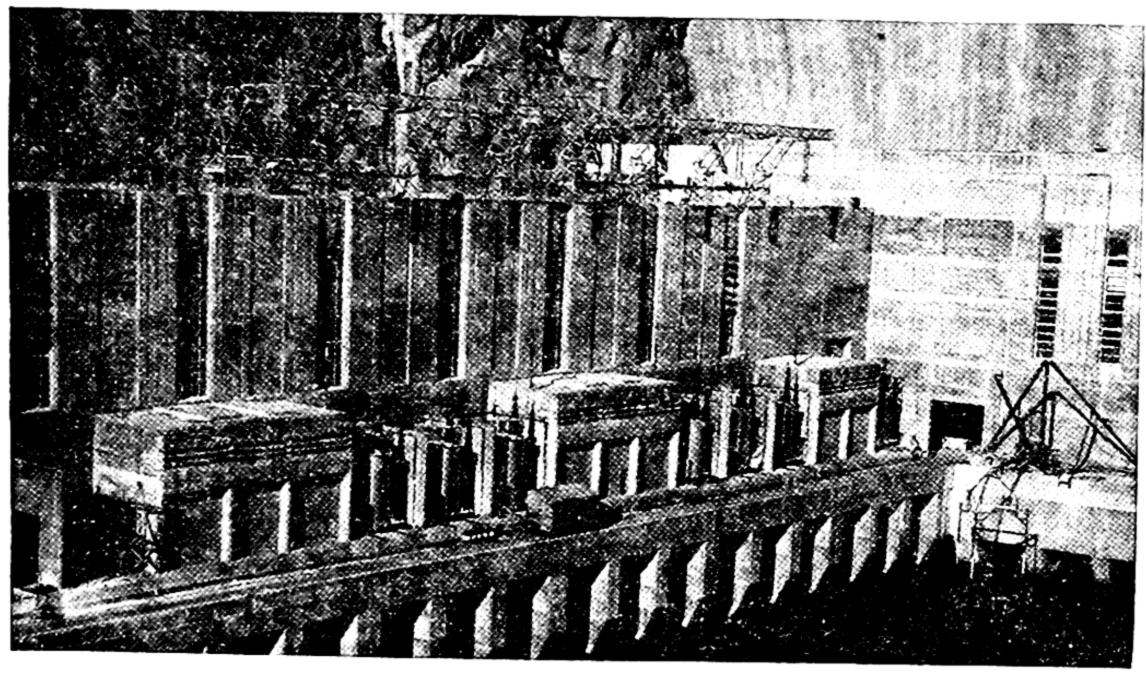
A section of the power plant at Boulder Dam. The dam is one of the largest reinforced concrete structures in the world.
